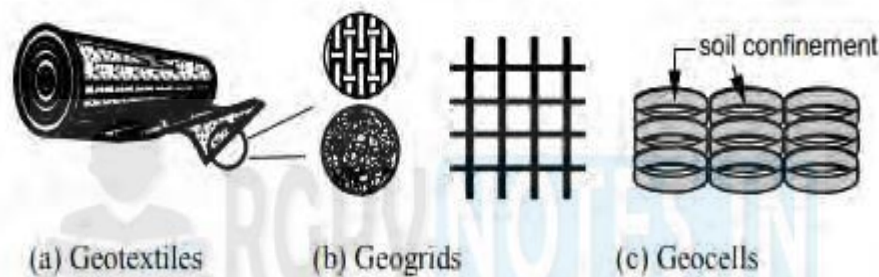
Geosynthetics commonly used for soil reinforcement
